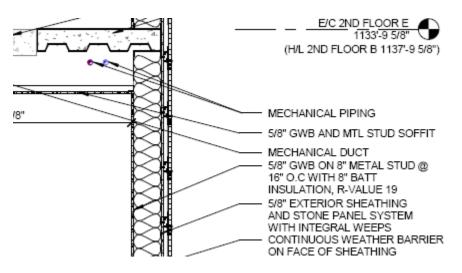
Wall Section at Large Projection Stone Panels | AE322
